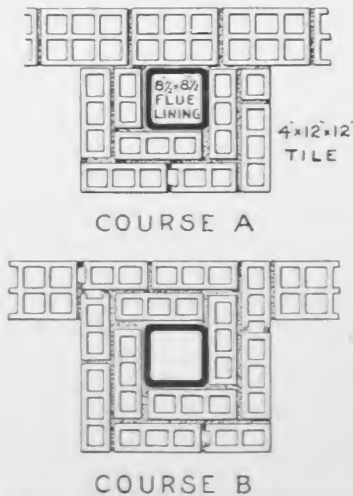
PLAN SHOWING BOTH INSIDE AND OUTSIDE CHIMNEYS.
